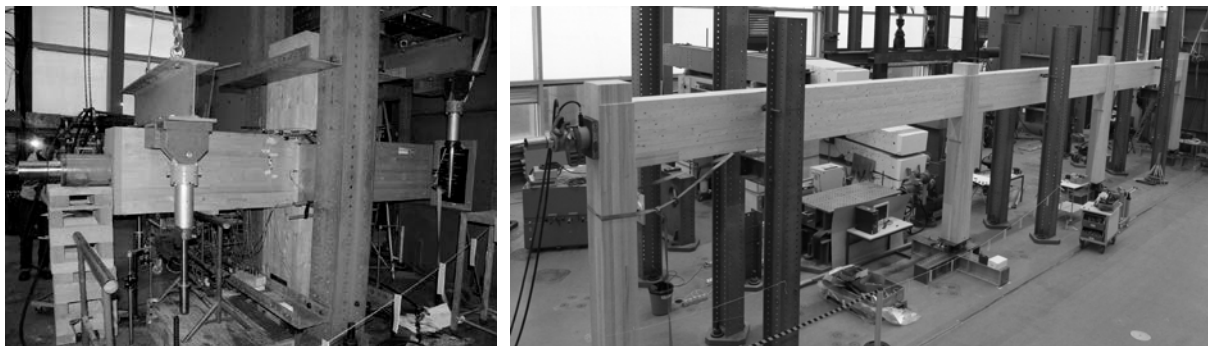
Tests on a post-tensioned timber connection under vertical loading (left) and tests on a post-tensioned timber frame under horizontal loading (right)
